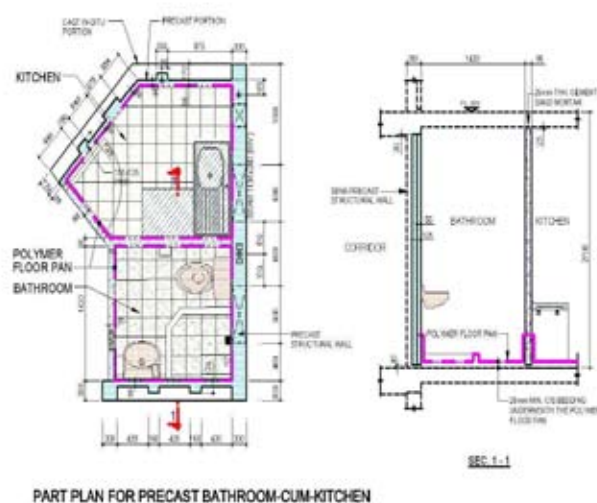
Framing Plan of Precast Bathroom-cum-kitchen
